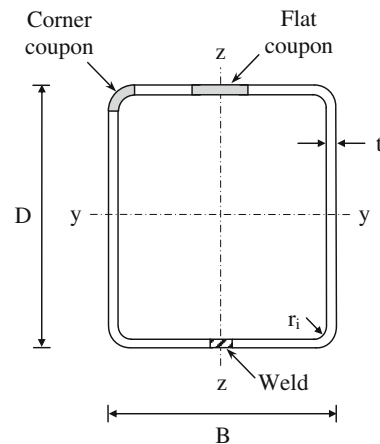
Section labelling convention and location of flat and corner tensile coupons.
